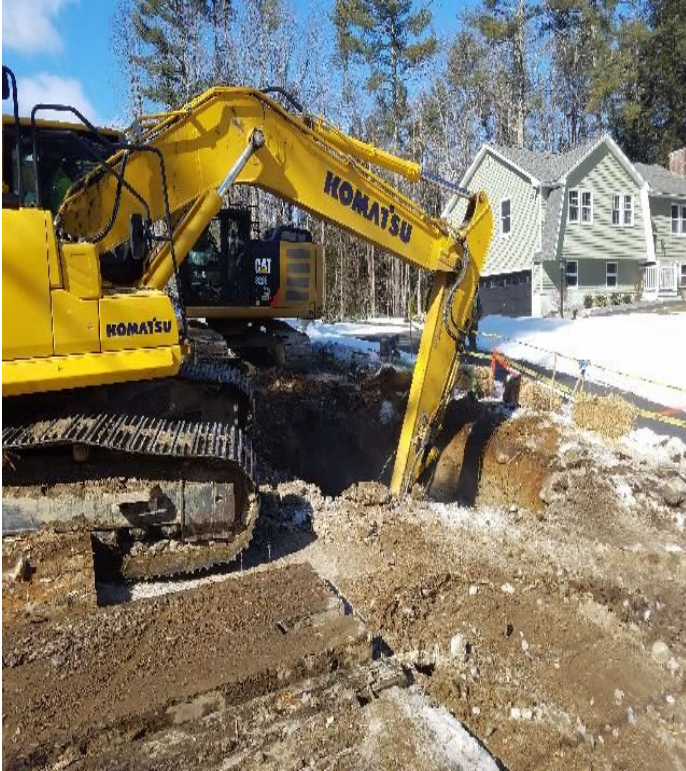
Crew excavating foundation for Str. 67. Viewing west. (02-20-20).
